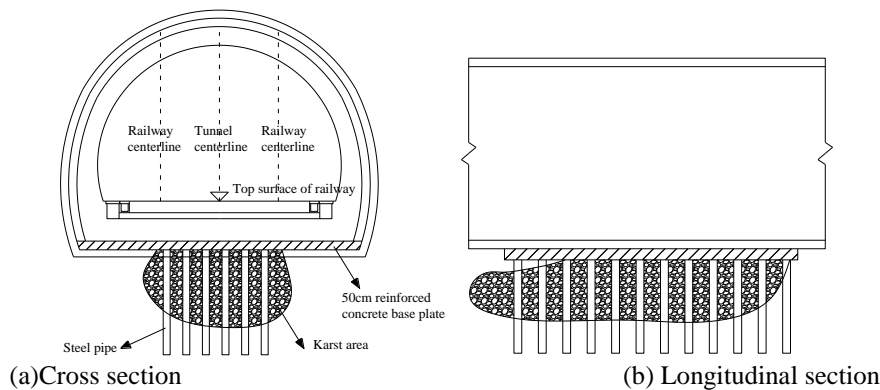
Layout of base pile group steel pipe reinforcement scheme
